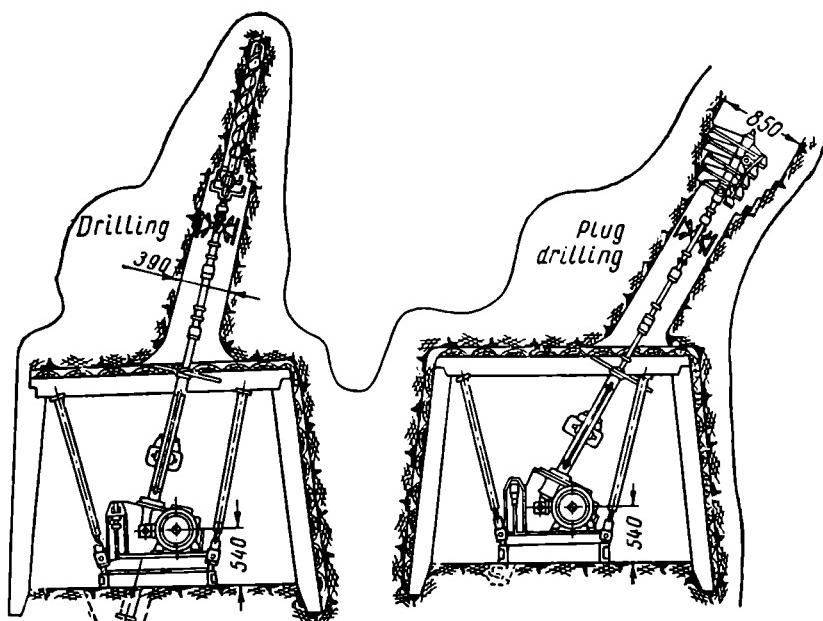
Diagram showing the operation of a heavy-type "break-through" drilling machine
